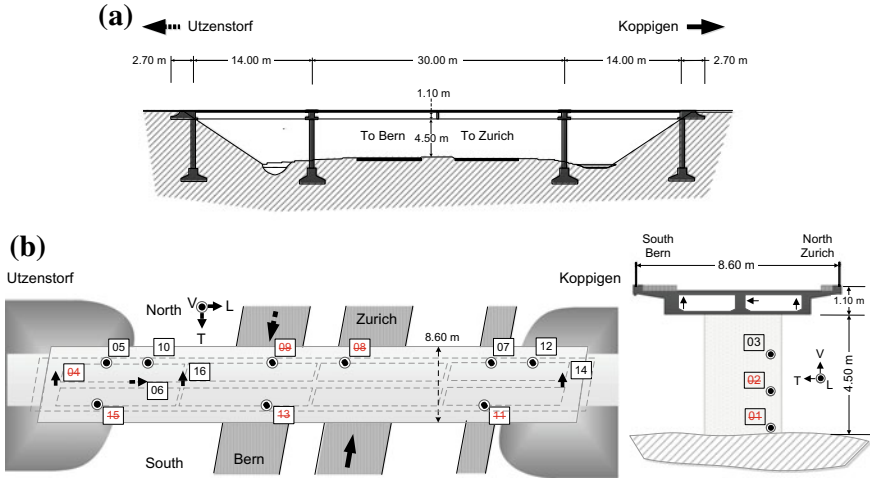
Longitudinal section (a), and the location and orientation of accelerometers (b) on the Z-24 Bridge. Marked sensors failed during the monitoring campaign [41]
